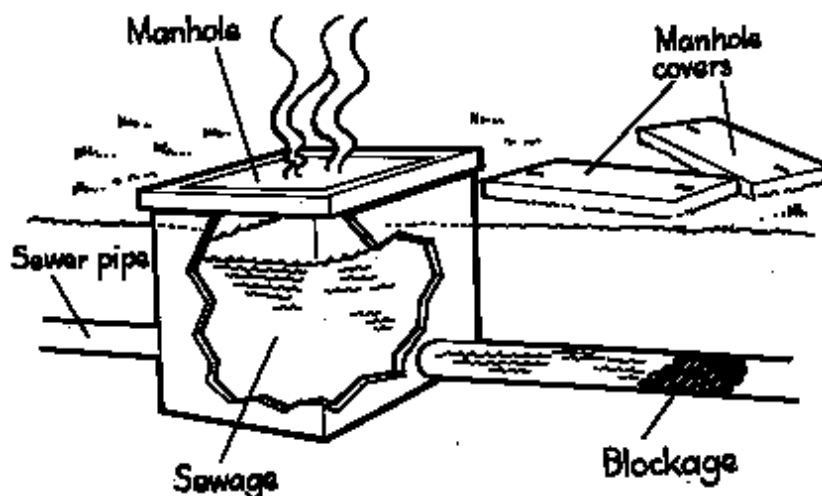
A blockage in the sewer pipe can cause the wastewater to build-up in the manhole.
